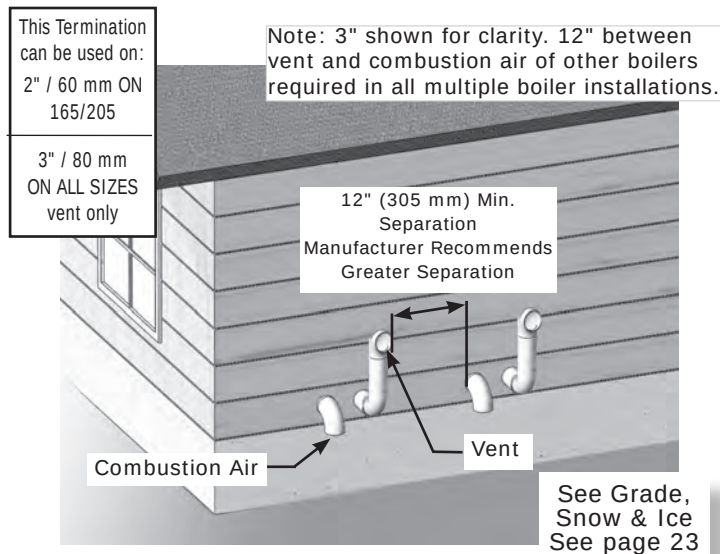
(3" / 80 mm ONLY) Twin Pipe Side Wall with 45° Vent
